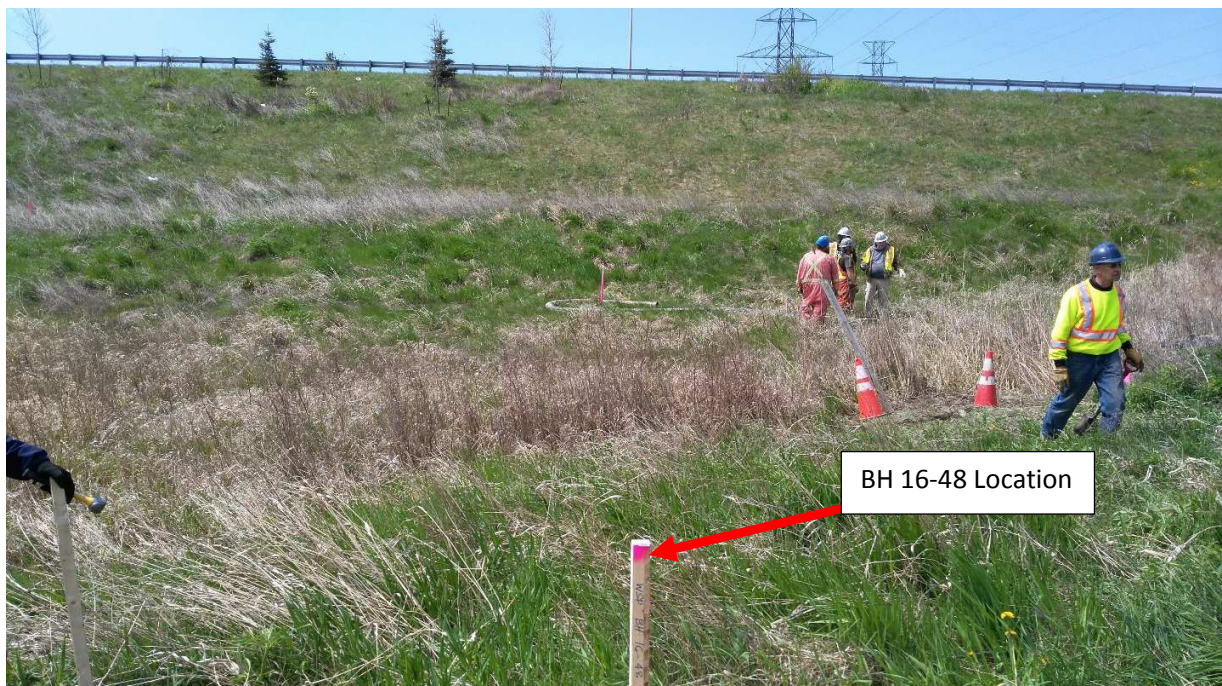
Facing West, near BH16-48 (Appr. Sta. 10+070)
